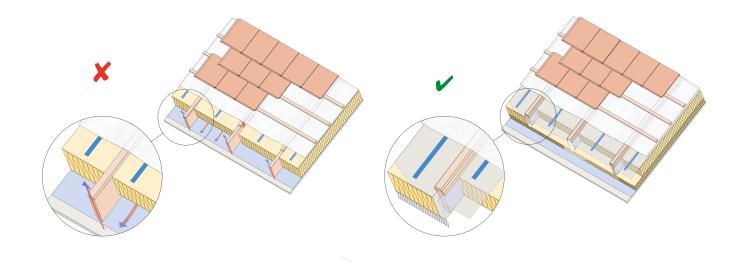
Where a roof is being upgraded without removing the roof covering, it is necessary to maintain a ventilation path. If the insulation is not protected, it could be subjected to wind washing. This can be avoided by installing a low vapour resistance membrane above the insulation (as shown) whilst maintaining the ventilation space.
